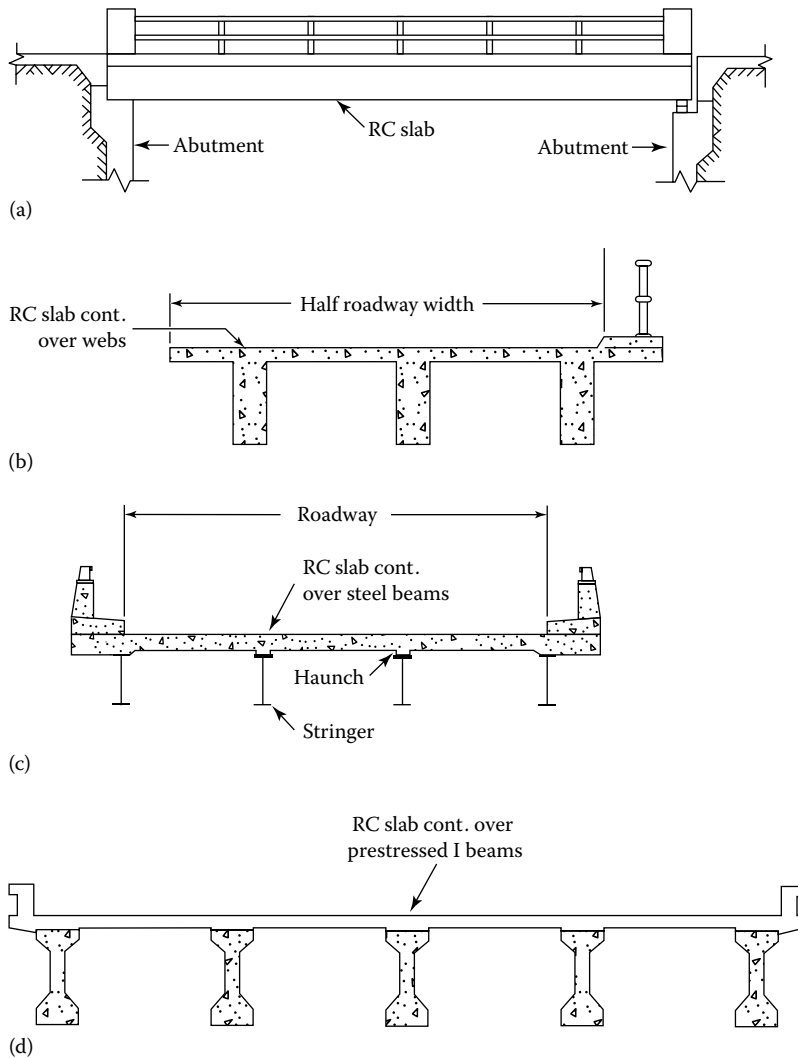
Concrete slabs and deck systems for highway bridges: (a) a slab bridge is supported directly over the abutments and/or intermediate piers, (b) deck of a T-beam bridge is cast monolithically with the webs, (c) deck supported over steel beams, and (d) deck supported over prestressed concrete girders. In figure (a), the primary reinforcement is oriented parallel to the traffic; in figures (b), (c), and (d), the primary reinforcement is oriented perpendicular to the traffic.
